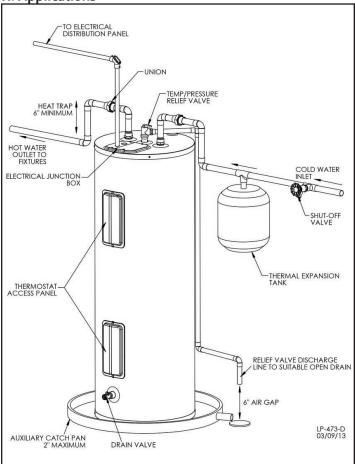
30, 40, and 50 Gallon Piping Detail - NOTE: Drawing is meant to demonstrate system piping concept. The installer is responsible for all equipment and detailing required by local codes. Heat traps are optional.
